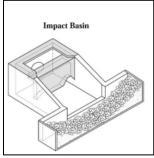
Impact basin (Outlet Erosion Control Structures, n.d.)
